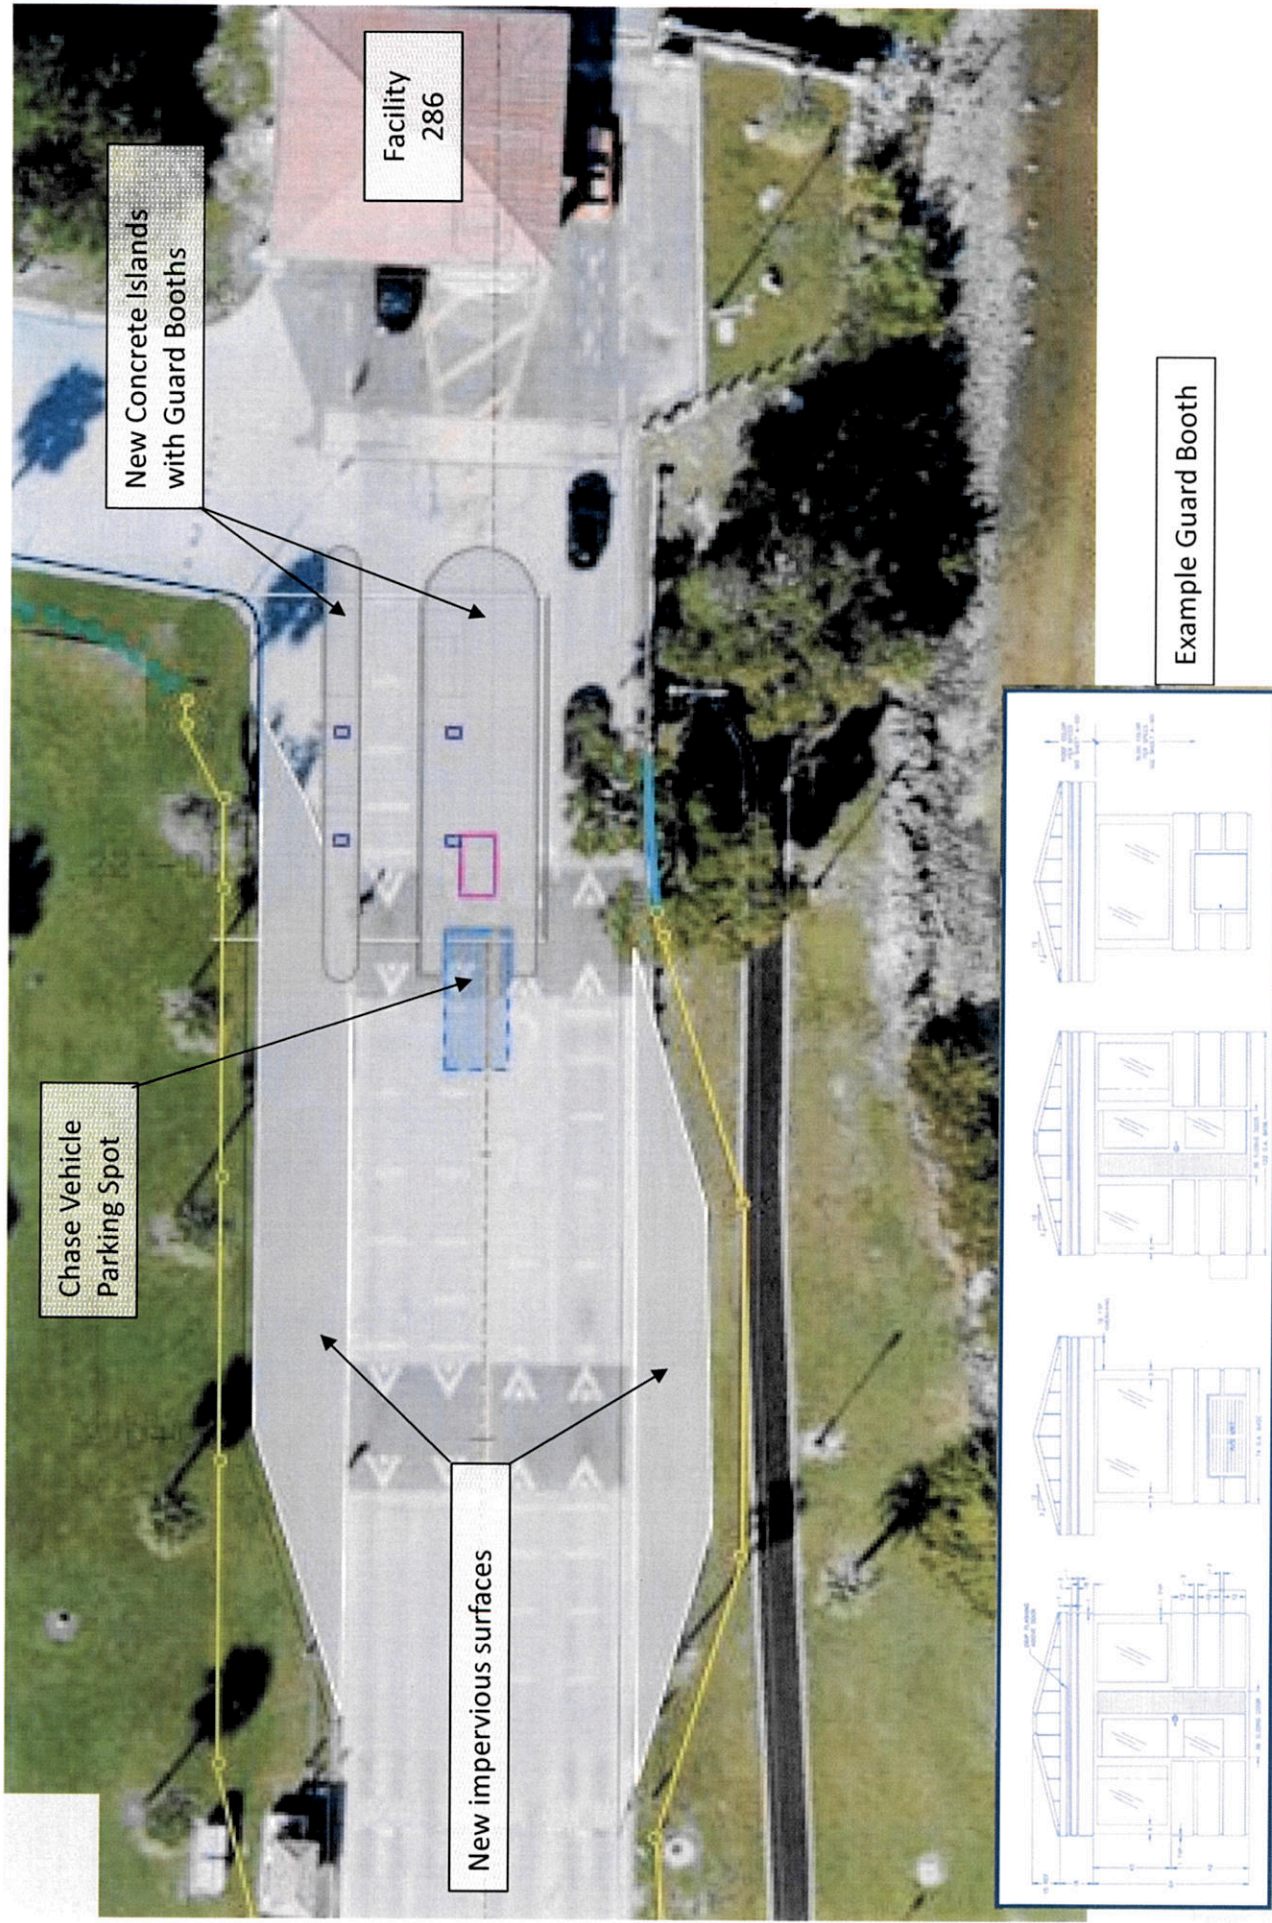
Proposed new impervious surfaces and concrete islands with guard booths for the Bayshore Vehicle Screening Area project. Guard booths will be simple structures, as shown above.
